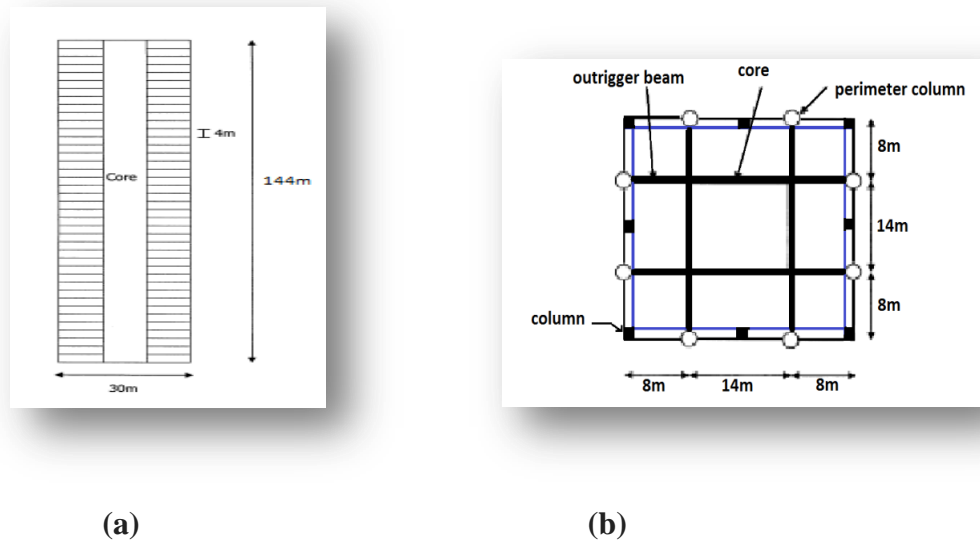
Buildings dimensions (a) in elevation, (b) in plan (some details and beams for gravity system omitted for clarity).
